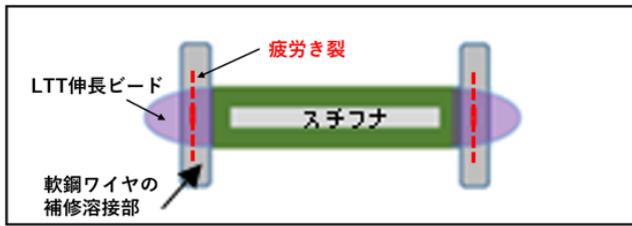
LTT elongated bead and repair welding bead for prevention of fatigue crack re-occurrence.
